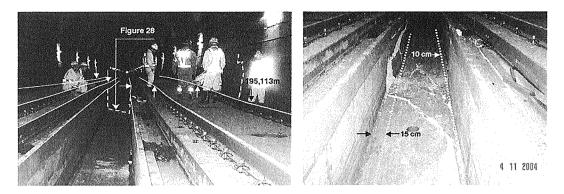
Diagonal cracks on the tunnel slab showing right-lateral offset
